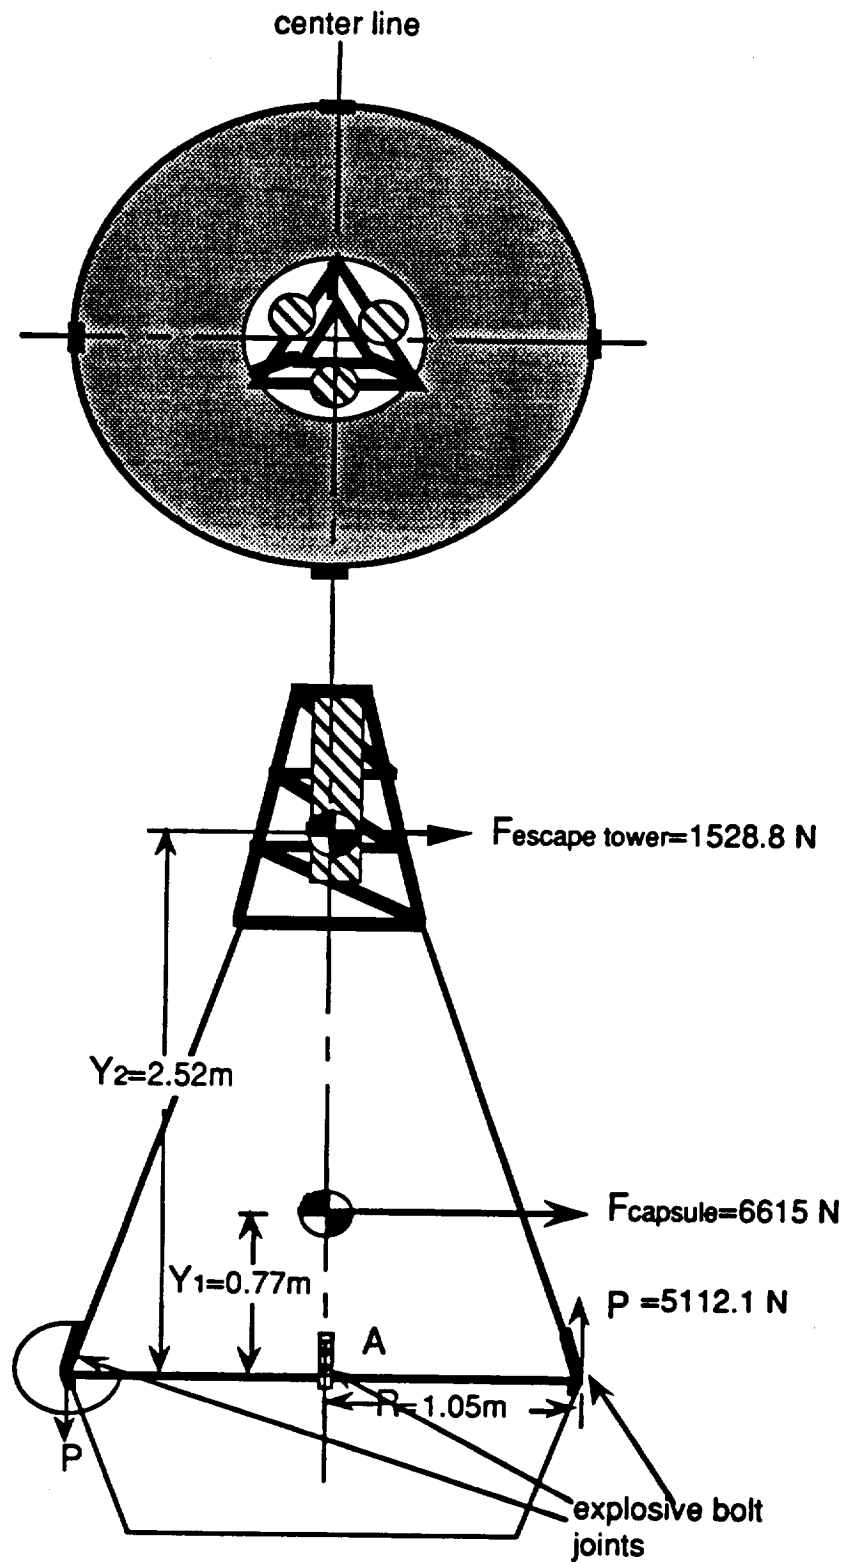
A Top and Side View of the Location of the Explosive Bolt Joints
